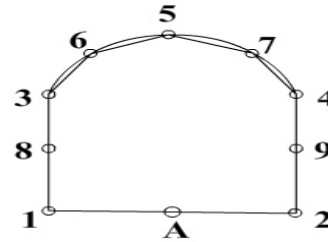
Solution Schematic Diagram of Tunnel Cross Section
